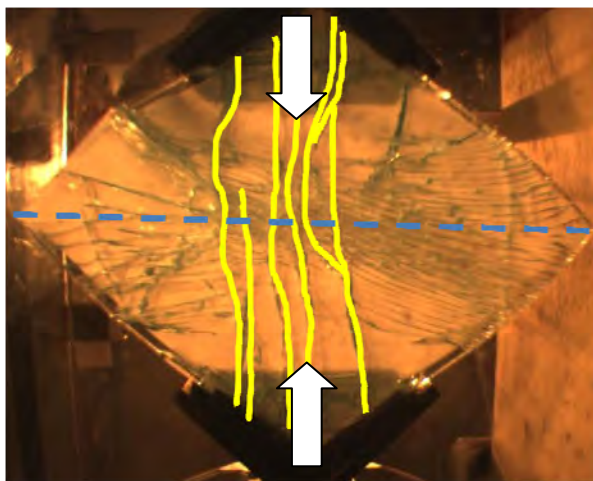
Small Scale at failure displacement – Typical Failure Mode: Buckling (12"x12" specimen with 2 mil film) – direction of loading indicated by white arrows.
